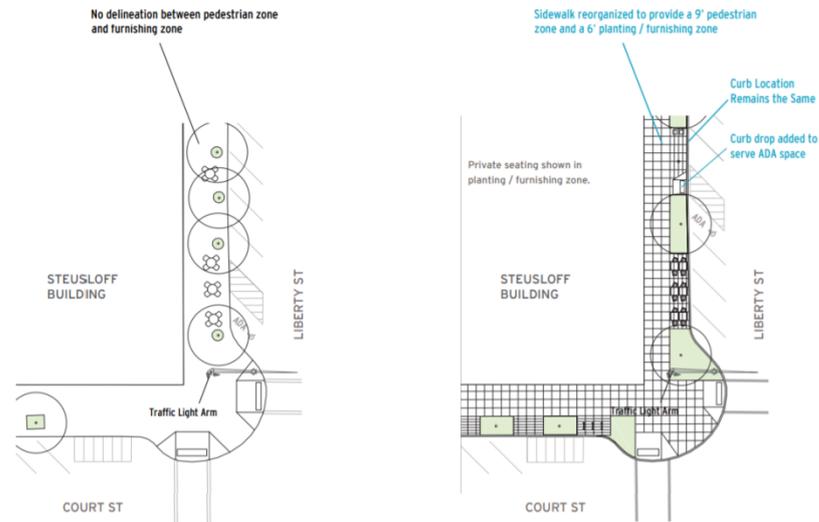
Existing condition (left) and improved Promenade corner (right) Streetscape Design
